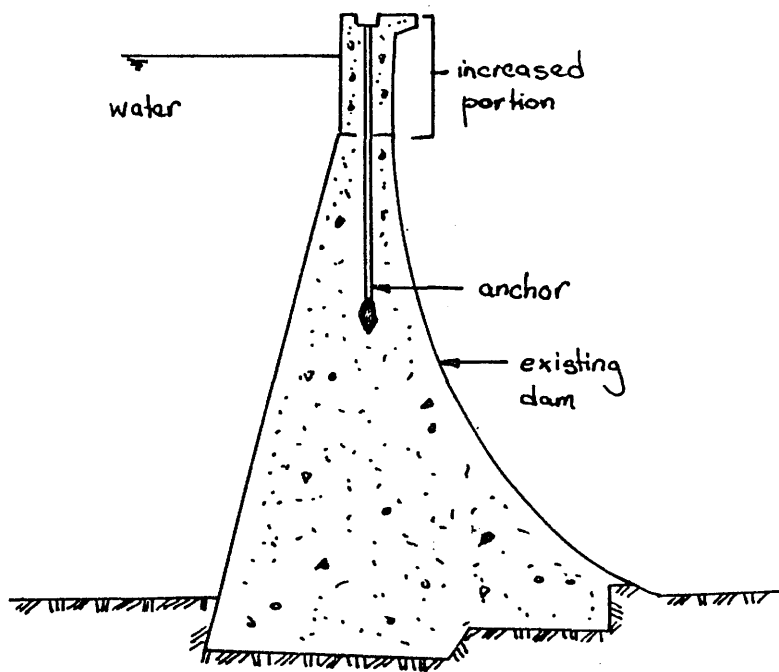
ANCHOR ARRANGEMENT FOR INCREASING HEIGHT OF DAM.
